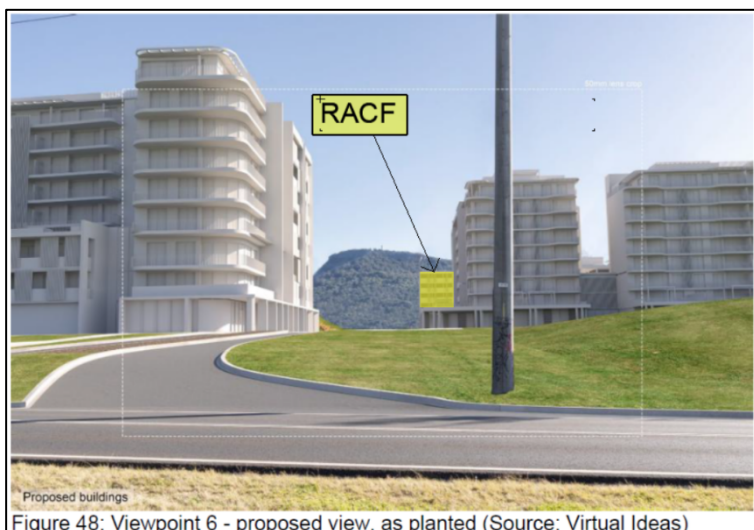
Viewpoint 6 - proposed view, as planted (Source: Virtual Ideas)
